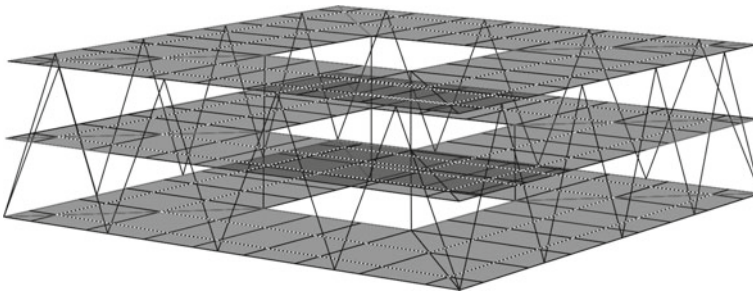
Module of a diagrid structure with square plan and straight elevation
